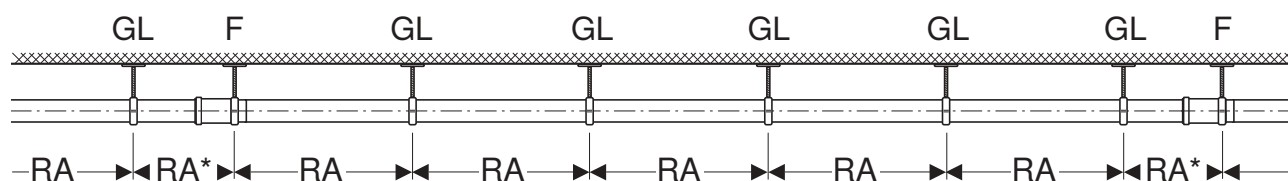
Pipe bracket spacing RA when fastening to ceilings and horizontally to walls, without support shells
